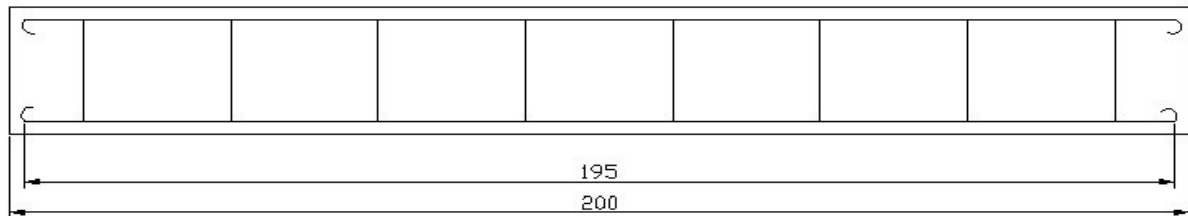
Beam1 (Two legged) & Beam 4(Three legged) with stirrups @ 250mm c/c spacing.
